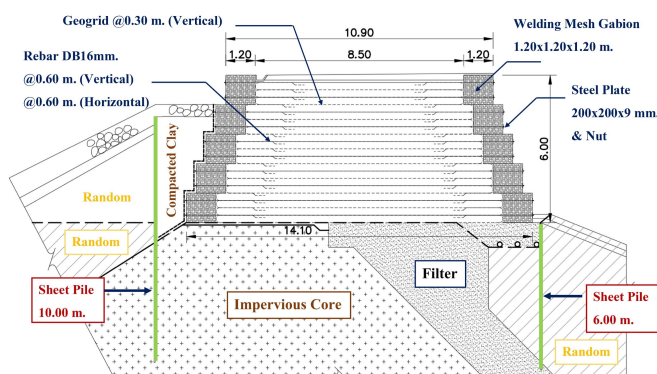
Restraint Back-to-Back MSE Wall (Soralump *et al.*, 2016)
